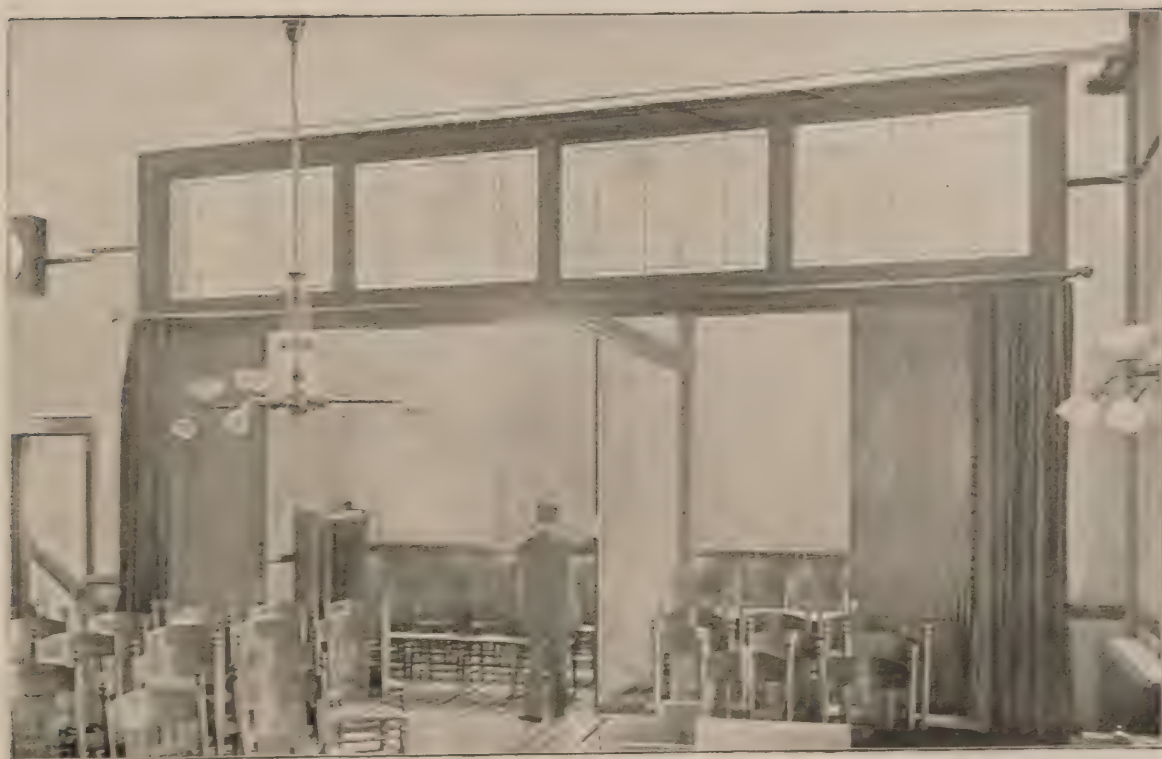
SHOWING PLANS OF PARTITION FORMING CLASS ROOM IN THE FIRST INTERNATIONAL EXHIBITION, NEW YORK.
